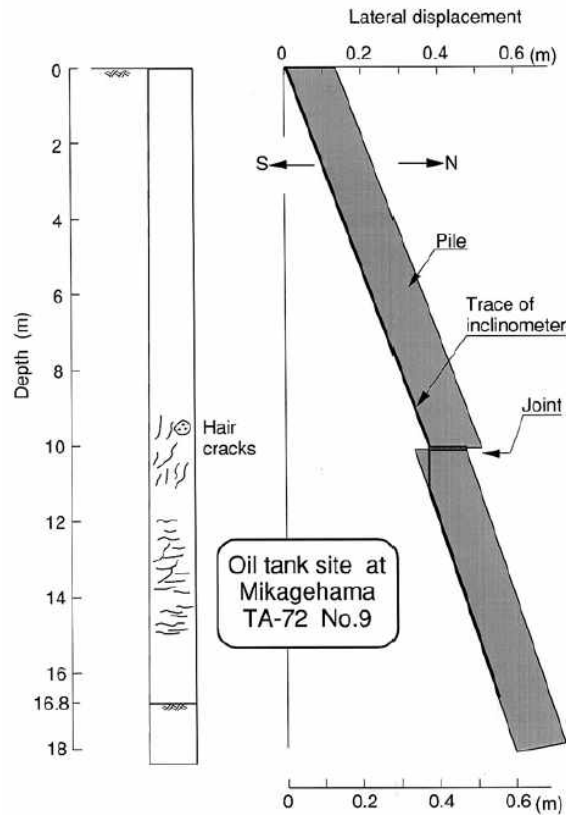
Lateral displacement and observed cracks on the inside wall of Pile No.2 (Ishihara et al. 2004)
